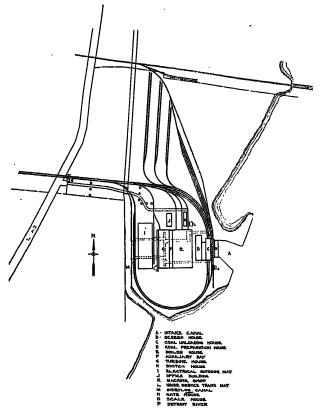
Ground Plan, Trenton Channel Plant and Yard
